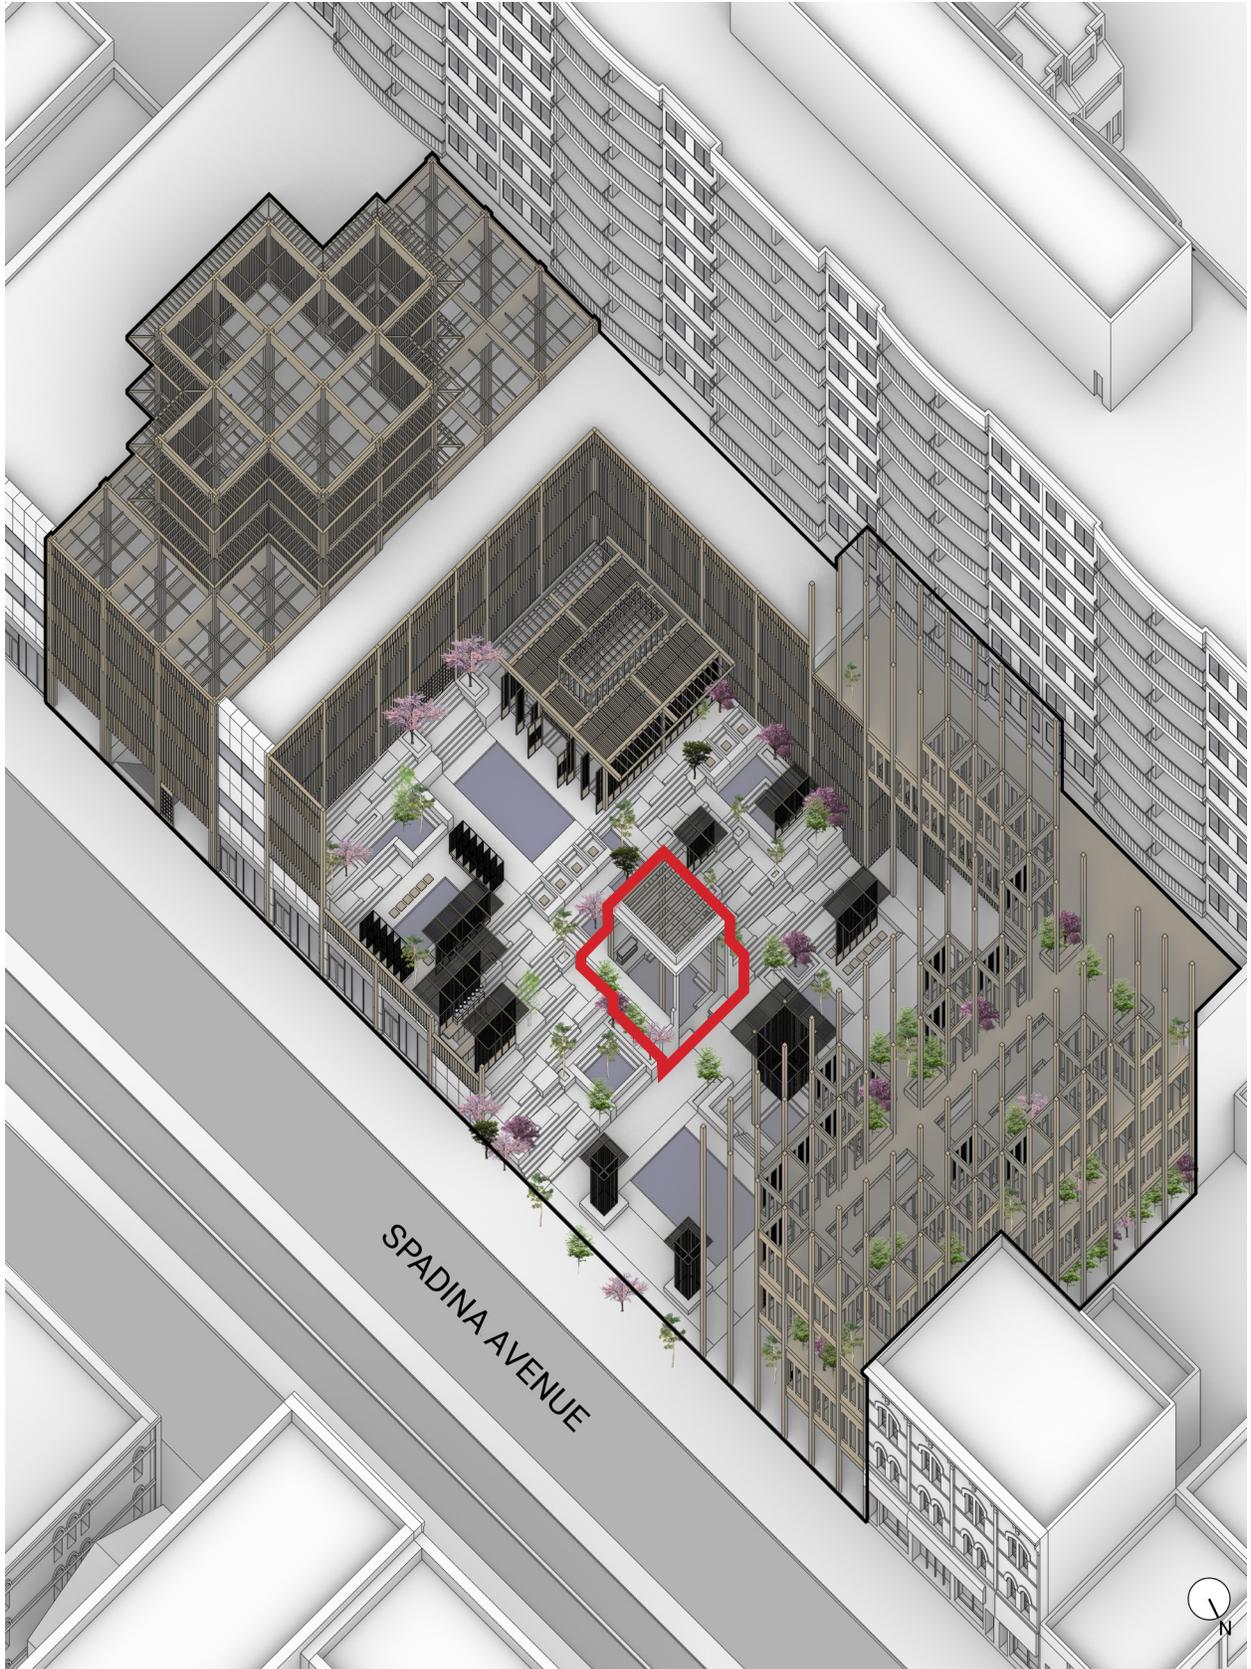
Location of The Quiet Retreat Room in Site Plan.
